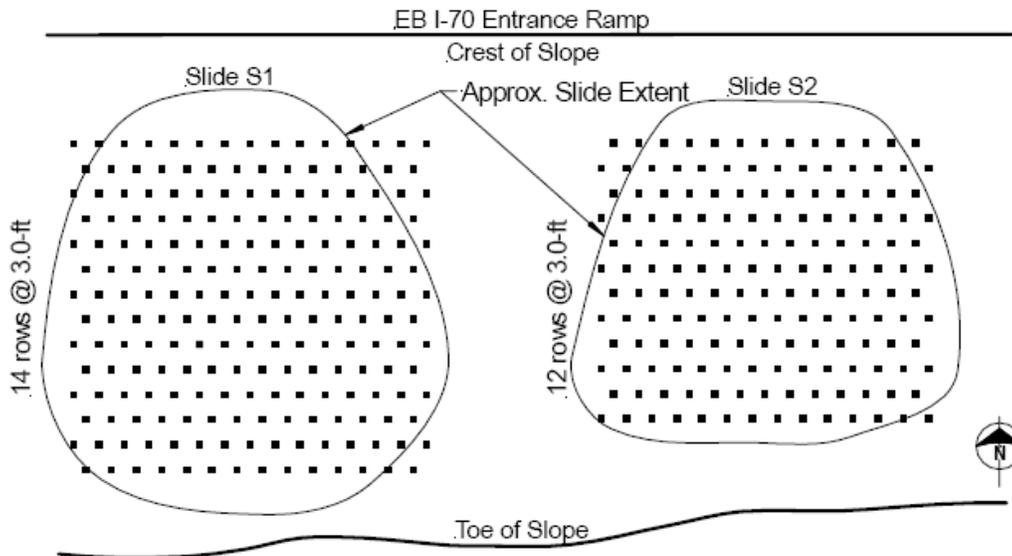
Plan view of slide areas S1 and S2 at the I-70 Emma site showing a selected layout of reinforcing members (Loehr and Bowders, 2007).
